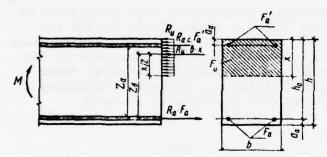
Drawing of the disposition of the compressed zone of the concrete and of the forces in a reinforced concrete slab of rectangular transverse cross section (with a calculation for stability).
